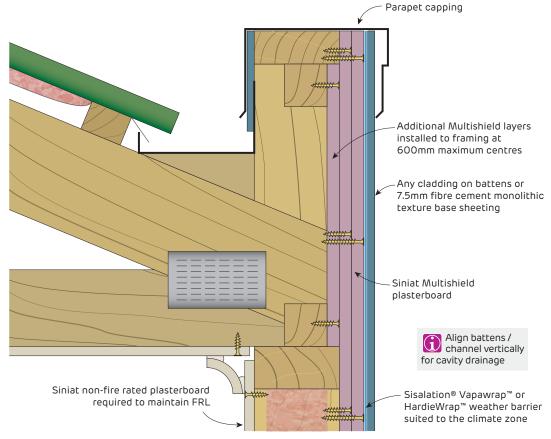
External Timber Wall to Non-combustible Roof Lining
